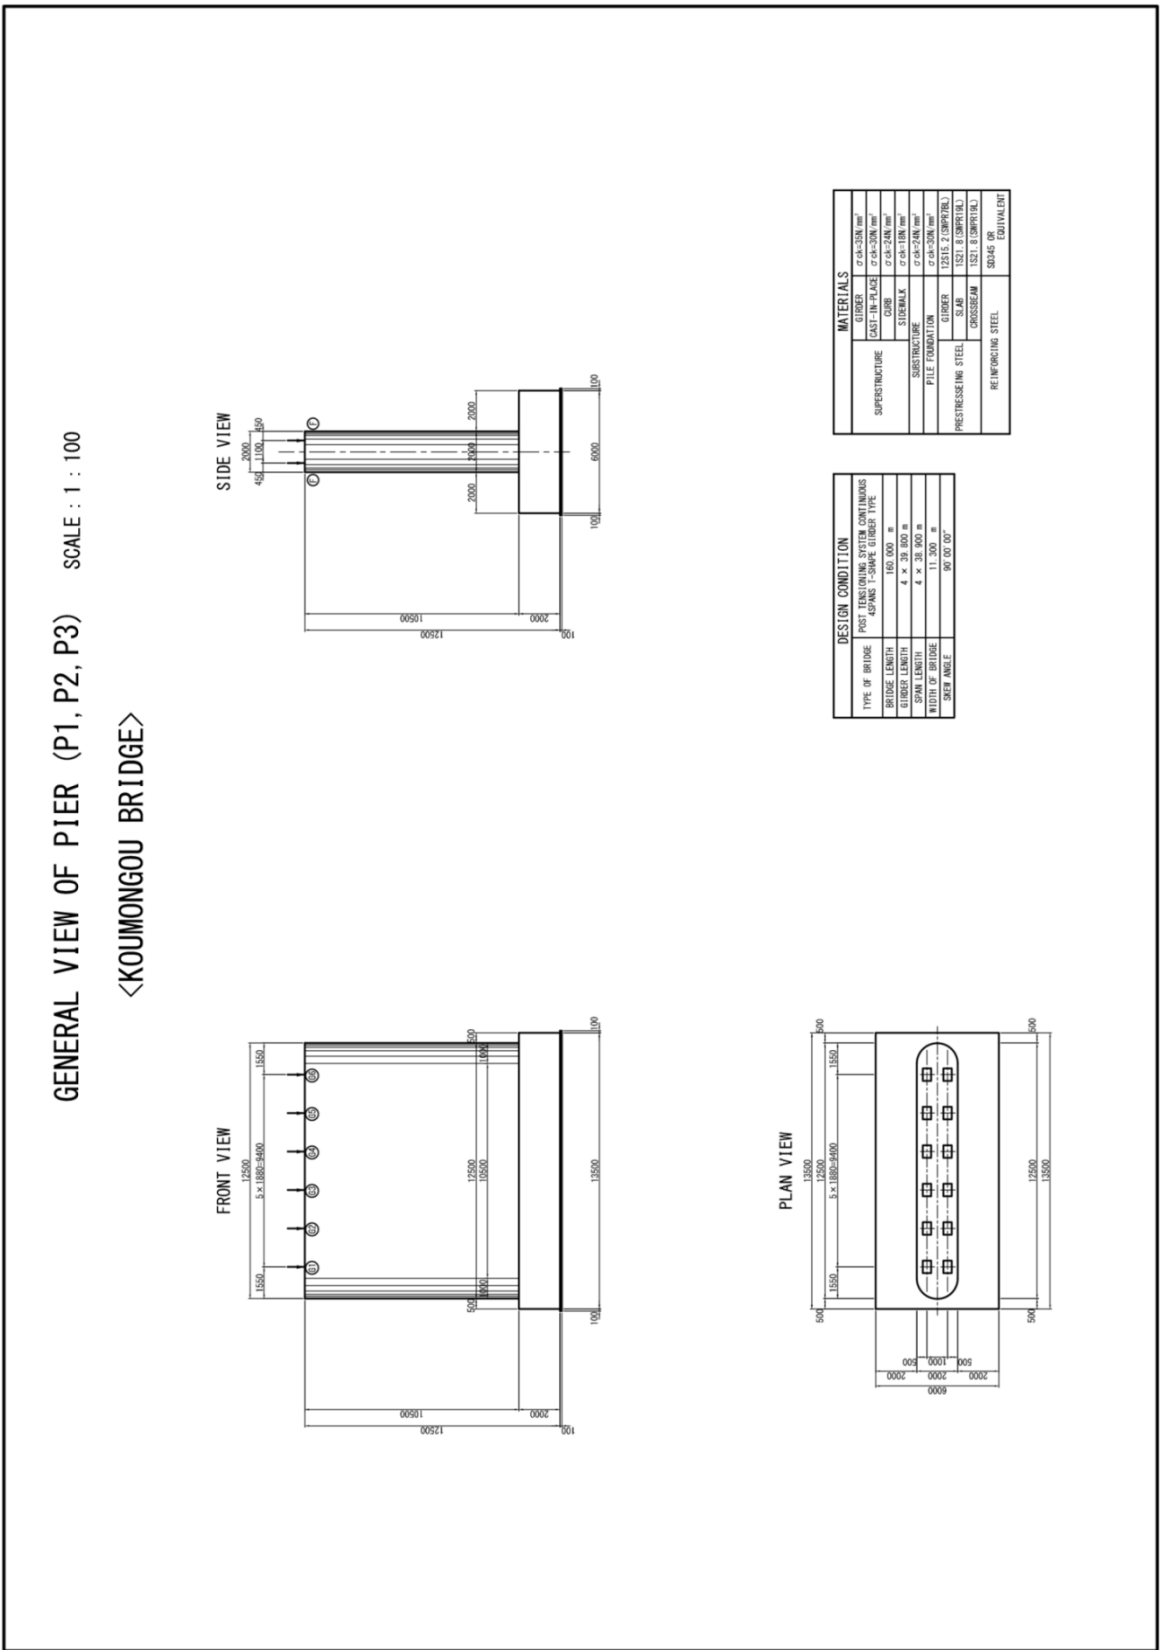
Structural Drawing of Substructure of Bridge across the Koumongou River (2)
